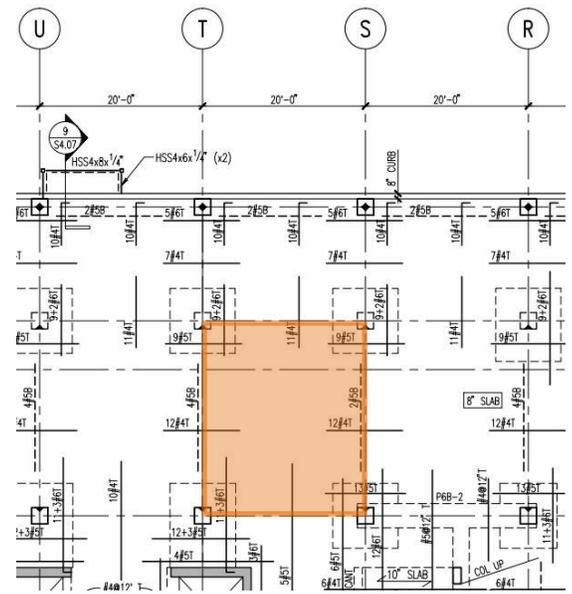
Plan of Garage Bay – by Cagley and Assoc.
